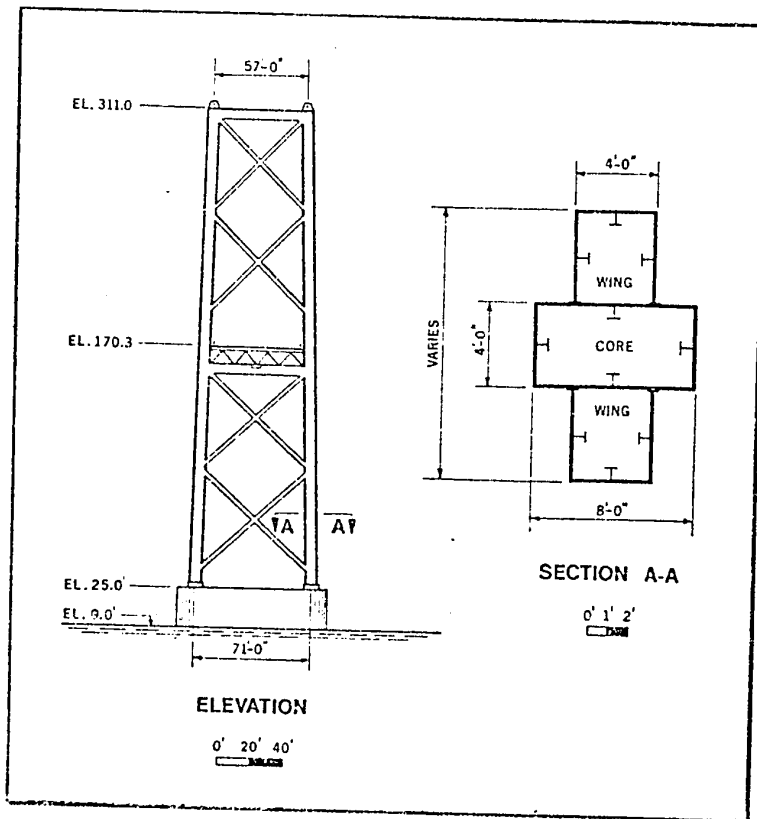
ELEVATION OF MAIN TOWERS AND TYPICAL COLUMN CROSS SECTION
